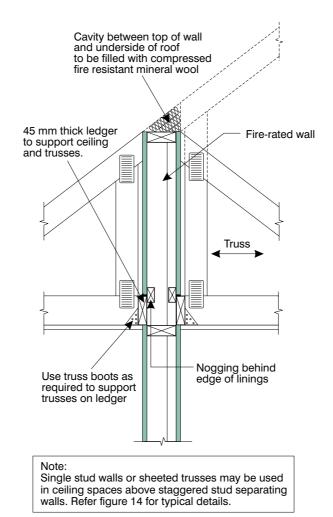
SEPARATING WALLS ABOVE CEILINGS
